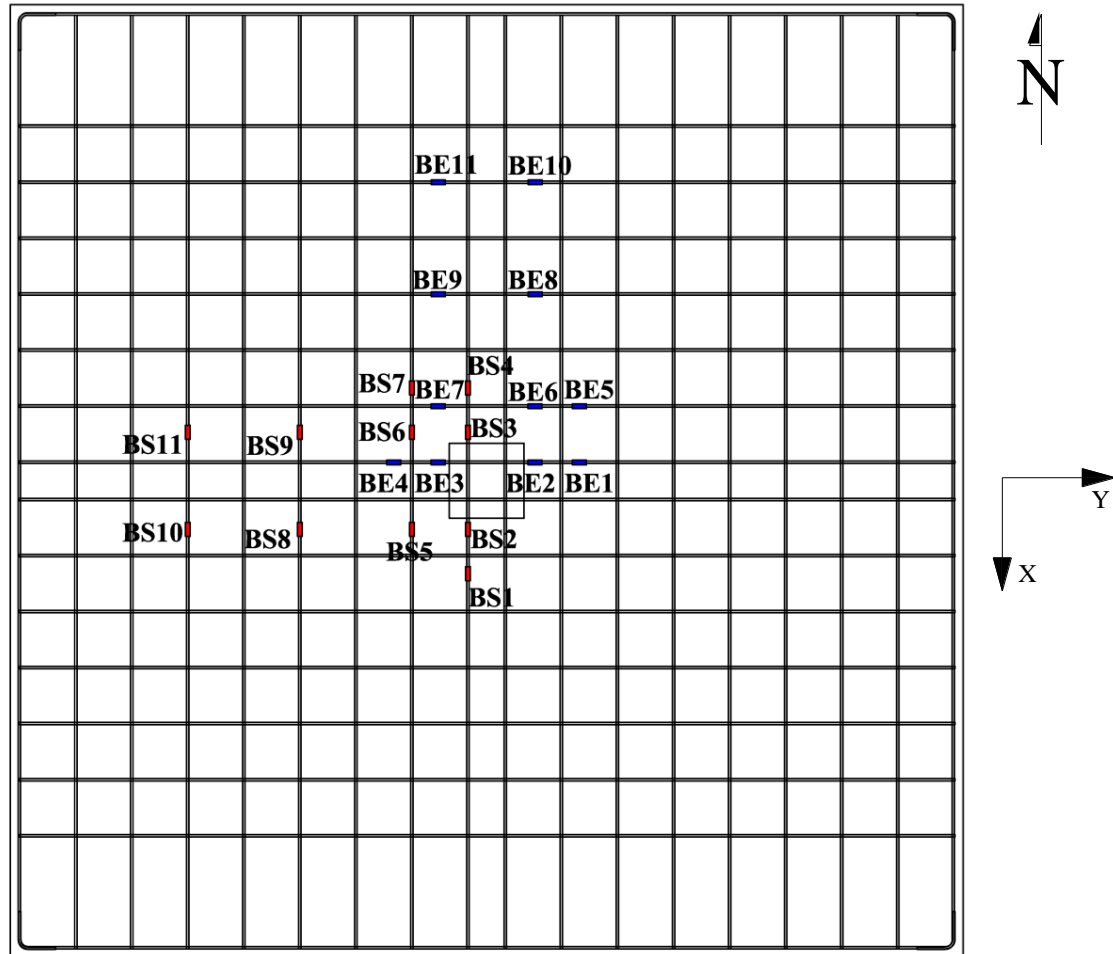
Strain Gauge Locations on Bottom Slab Reinforcing Bars
